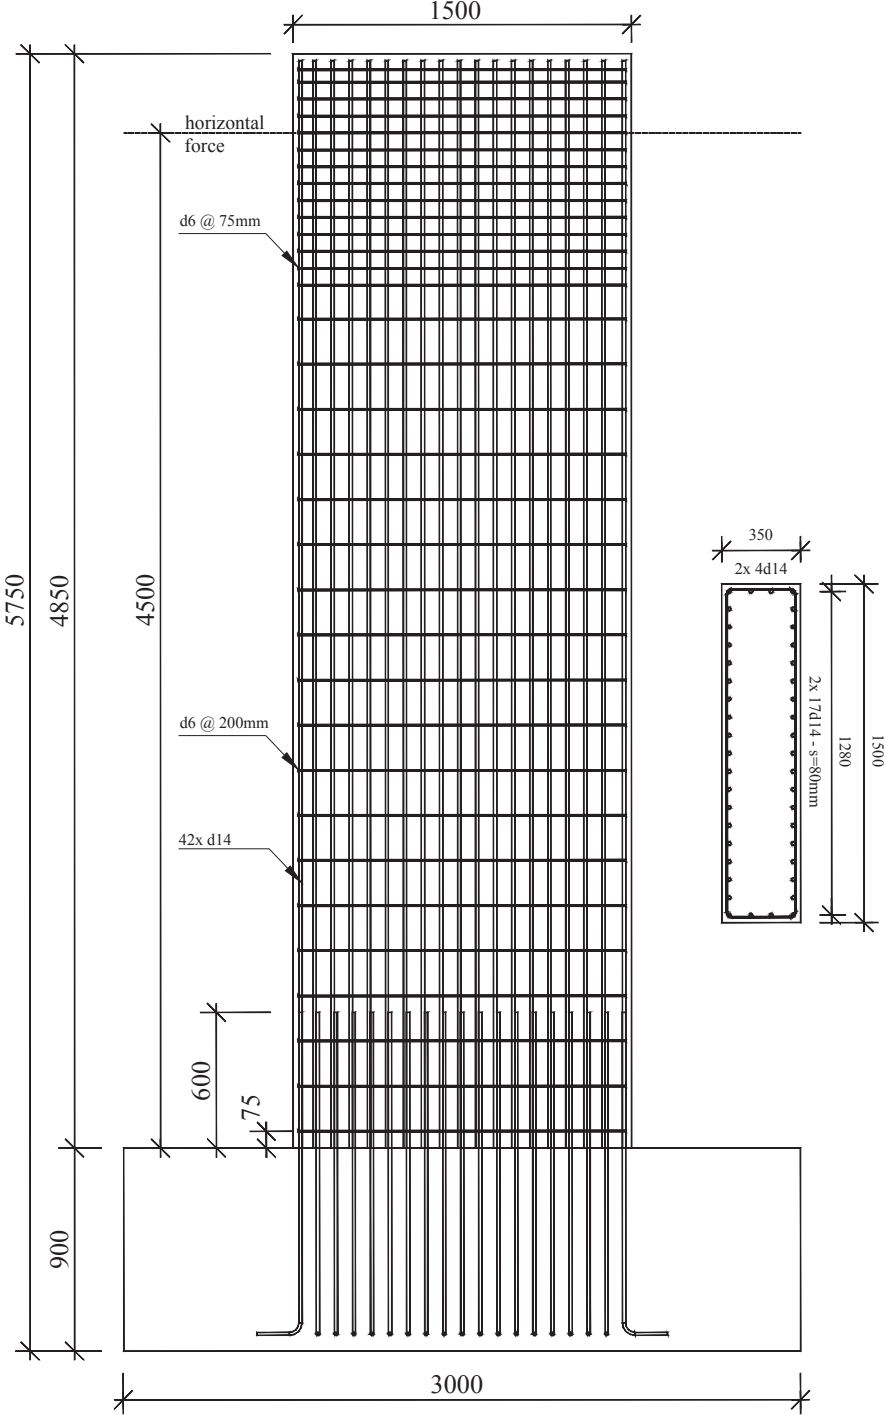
Reinforcement layout - elevation and cross section of test unit VK5. All dimensions in [mm].
